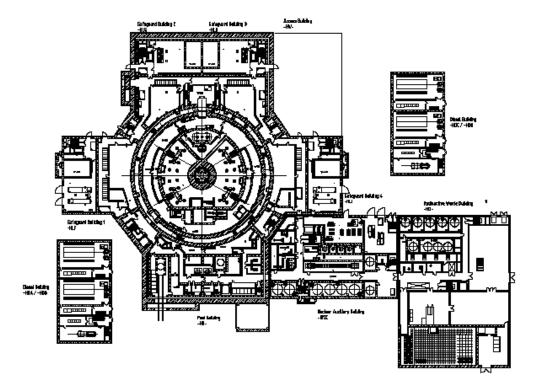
EPR<sup>™</sup> NI buildings – plan view at ± 0.00m
